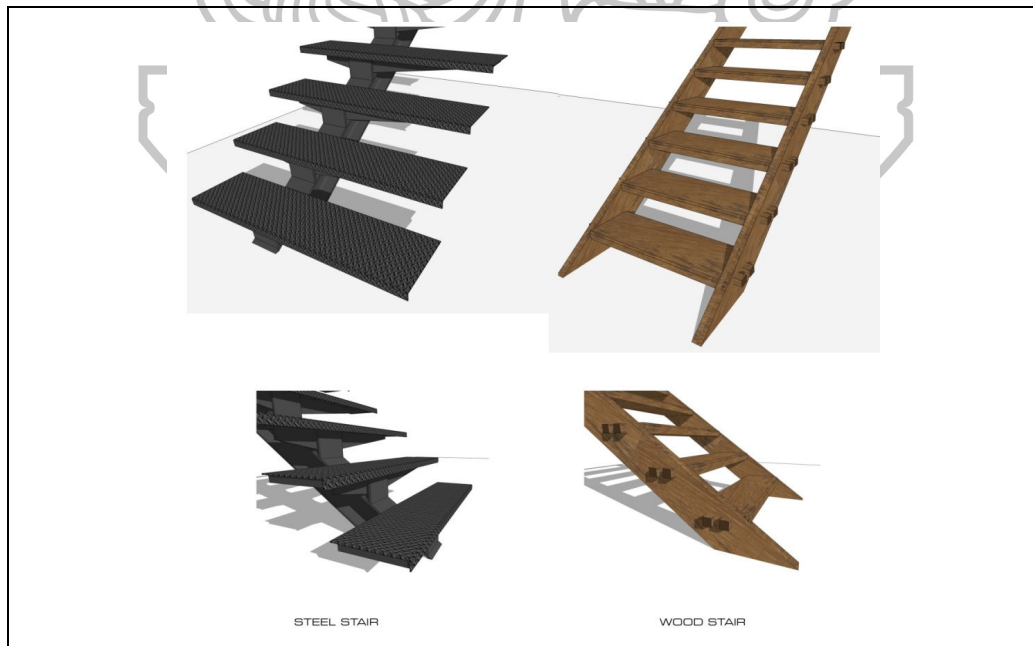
Architectural ornaments and details, The comparison of wood and steel
